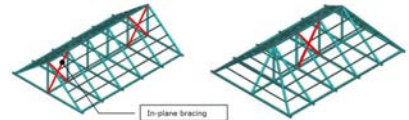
3. Vertical bracing between roof trusses shown in red. Note: Most roofs are occupied so cross bracing as shown here is not favoured and is rarely implemented.
